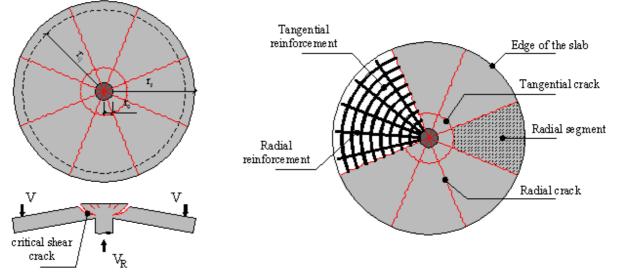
RC slab with axisymmetric structural conditions, crack pattern at ultimate limit state and reinforcement arrangement.
